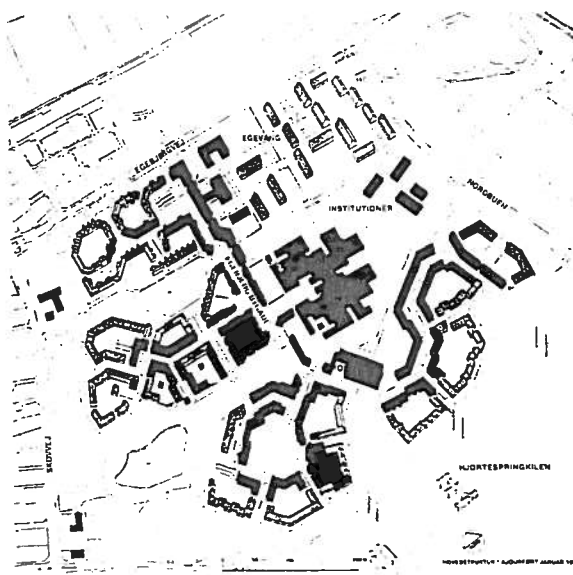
Ballerup/Egerbjerggaard: site plan.
